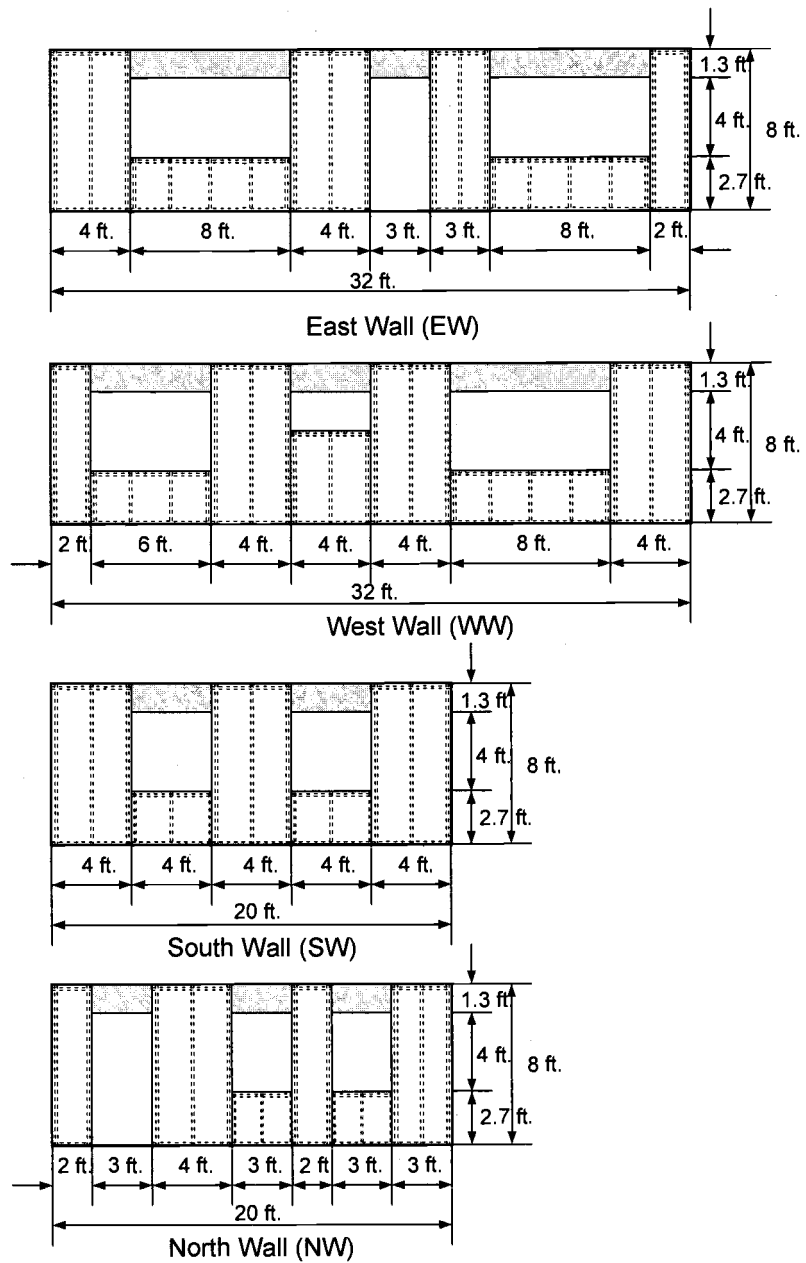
(c) – Detailed wall configurations for Type-III house model
